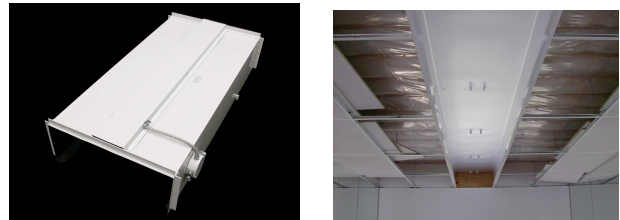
(a) Single light guide section and (b) modules installed in the ceiling
